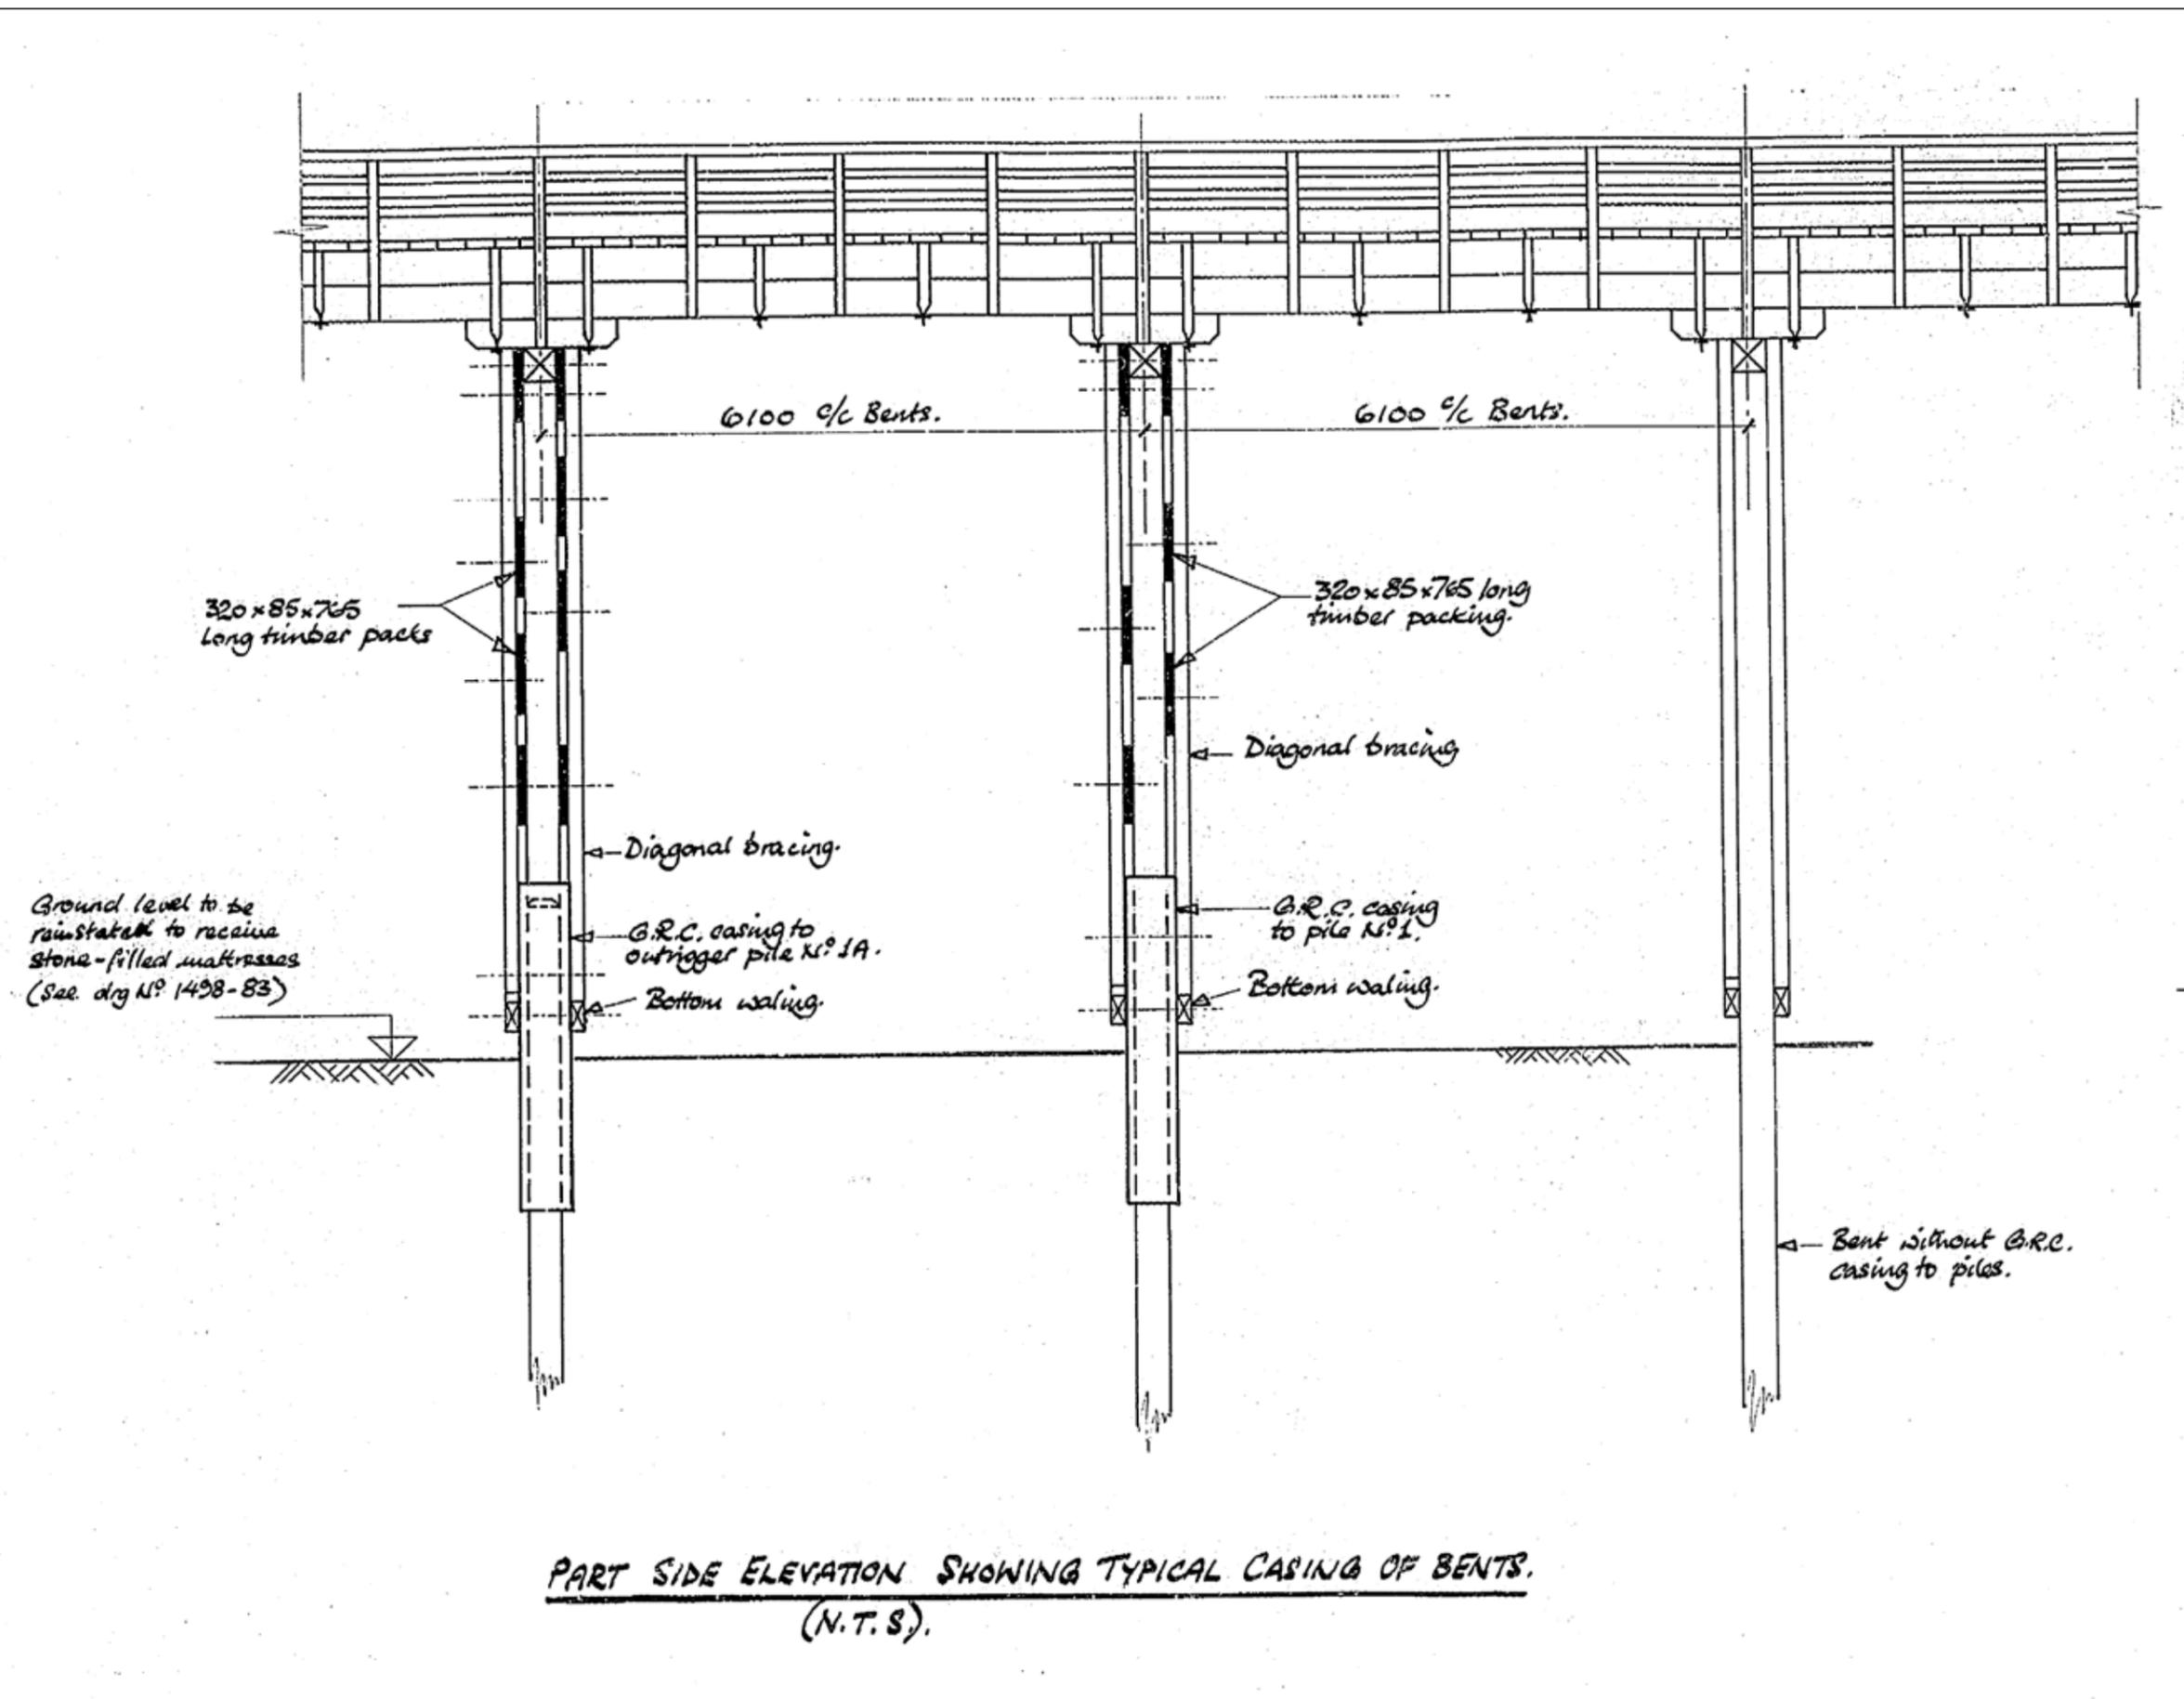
Technical drawings of repair and replacement works carried out on Barmouth Viaduct in 1985.
